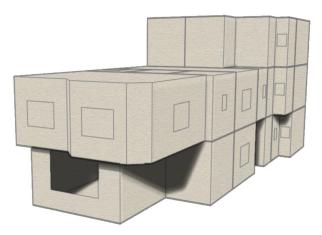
A 3D Schematic of Typical Building Without Rawshan.
